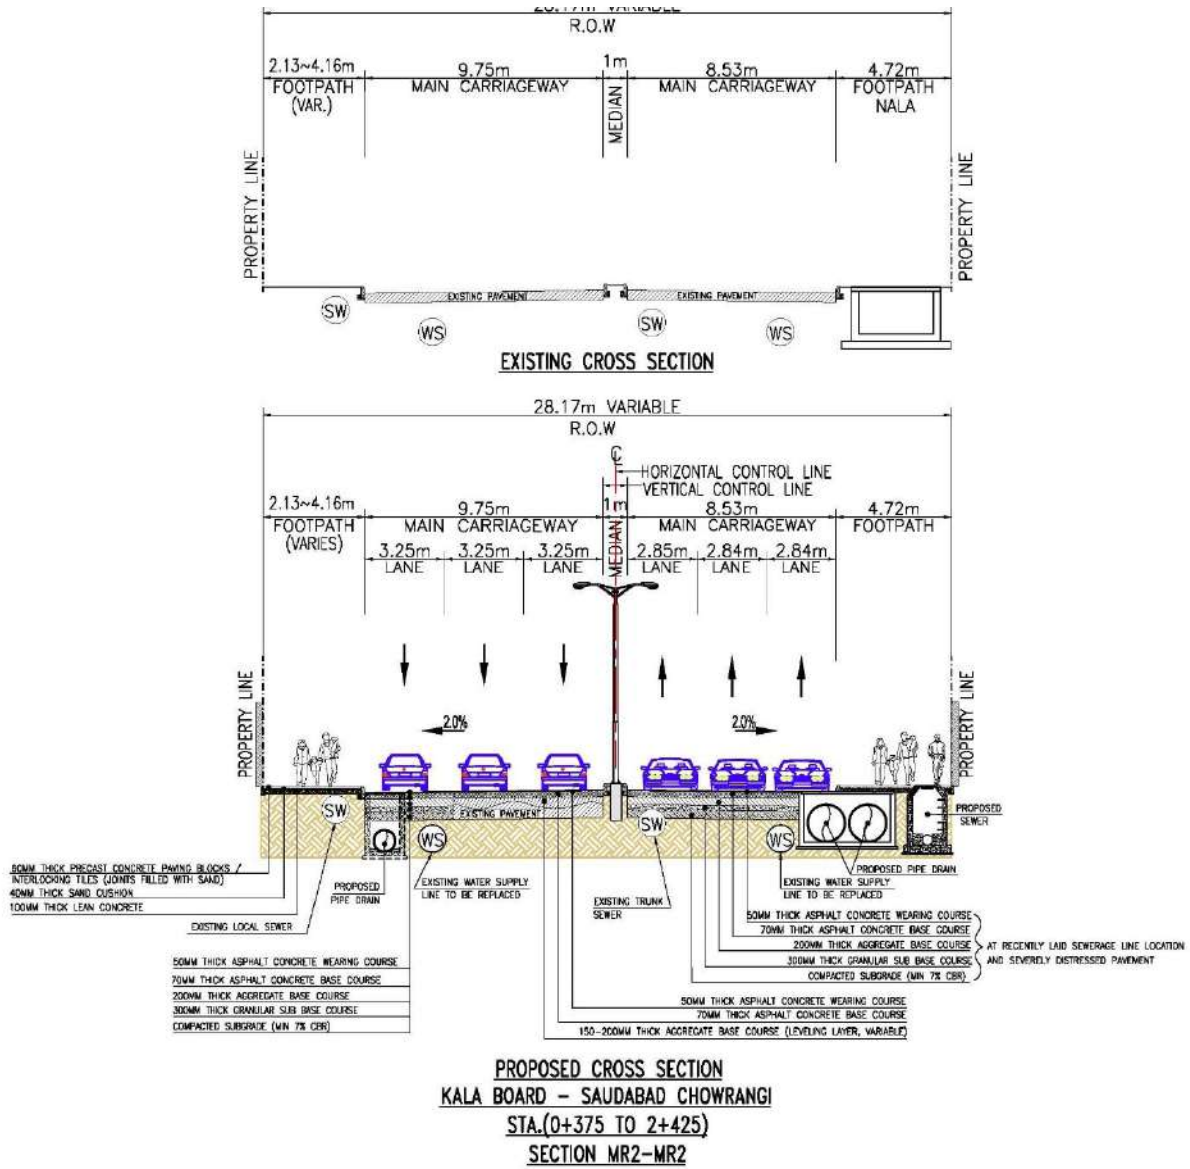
Existing and Proposed Cross Section of Kala Board to Saudabad Chowrangi (0+375 to 2+425 km)
